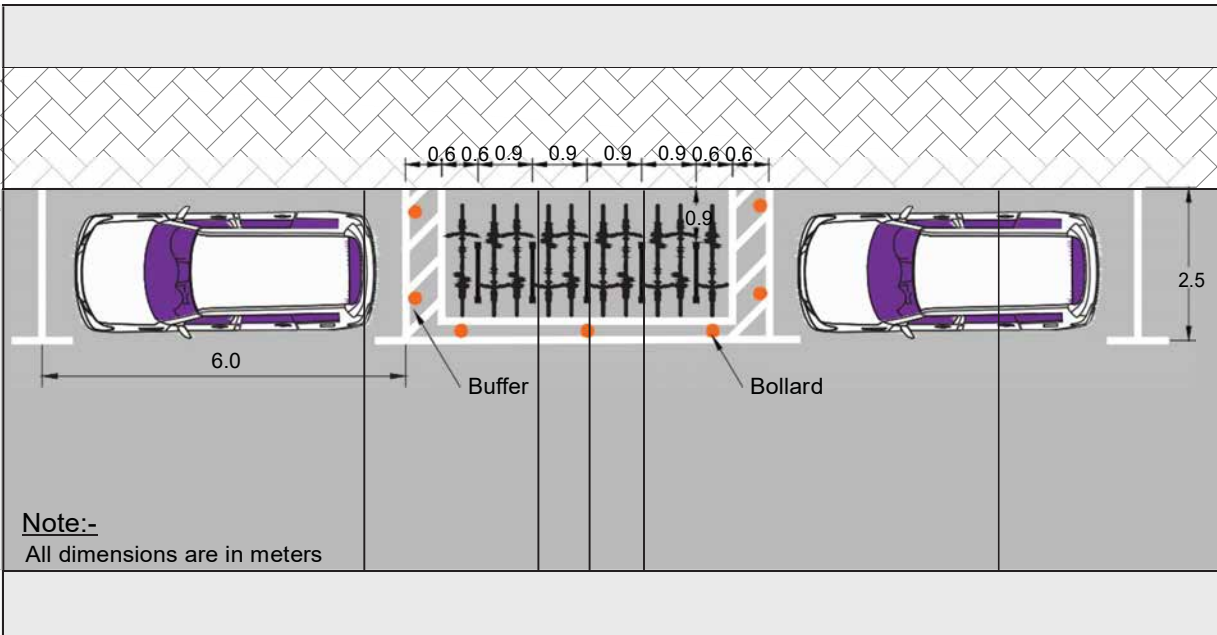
Typical Layout for Bicycle Parking in Converted Parallel On-Street Car Parking Space
